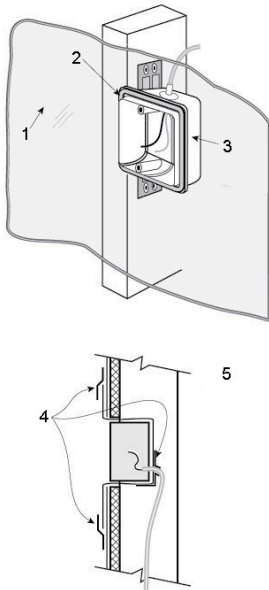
Exterior electrical boxes, showing proprietary air barrier material installed on sheathing but not shown for clarity, snap-on retainer, airtight plastic box, tape seal, and seal exterior electrical outlet boxes or use airtight plastic boxes
